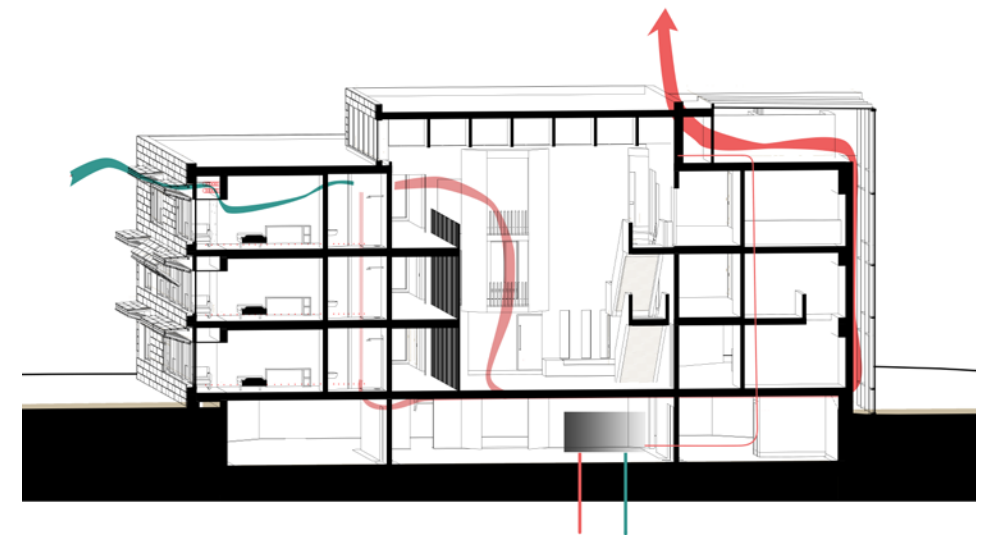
The flow of air through the building. Fresh air enters the rooms through the facade. It is sucked through the atrium to a solar facade which creates pressure through thermal draft.
